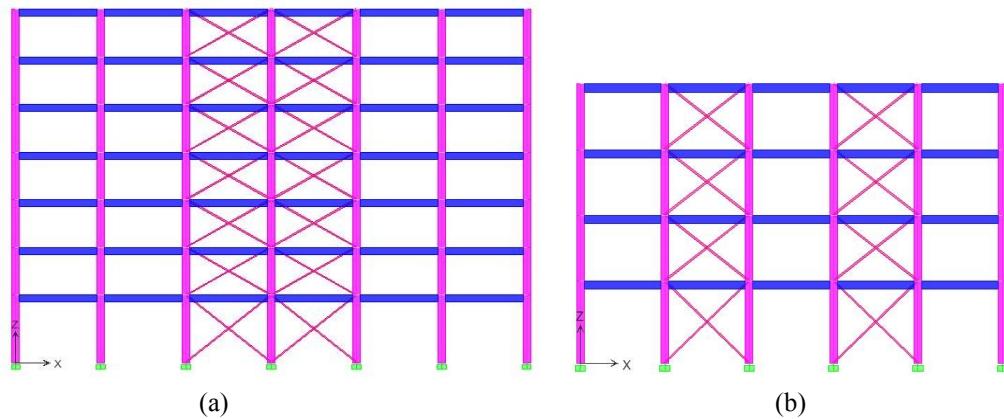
(a) Elevation of building-1 with cross bracing (b) Elevation of building-2 with cross bracing
